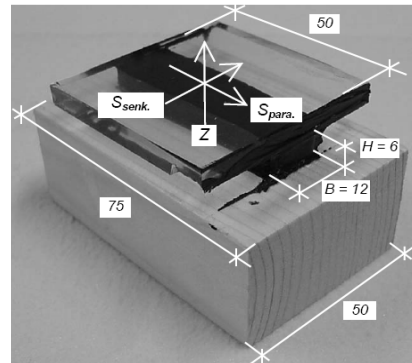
Specimens of a structural sealant glazing system with timber [10].
